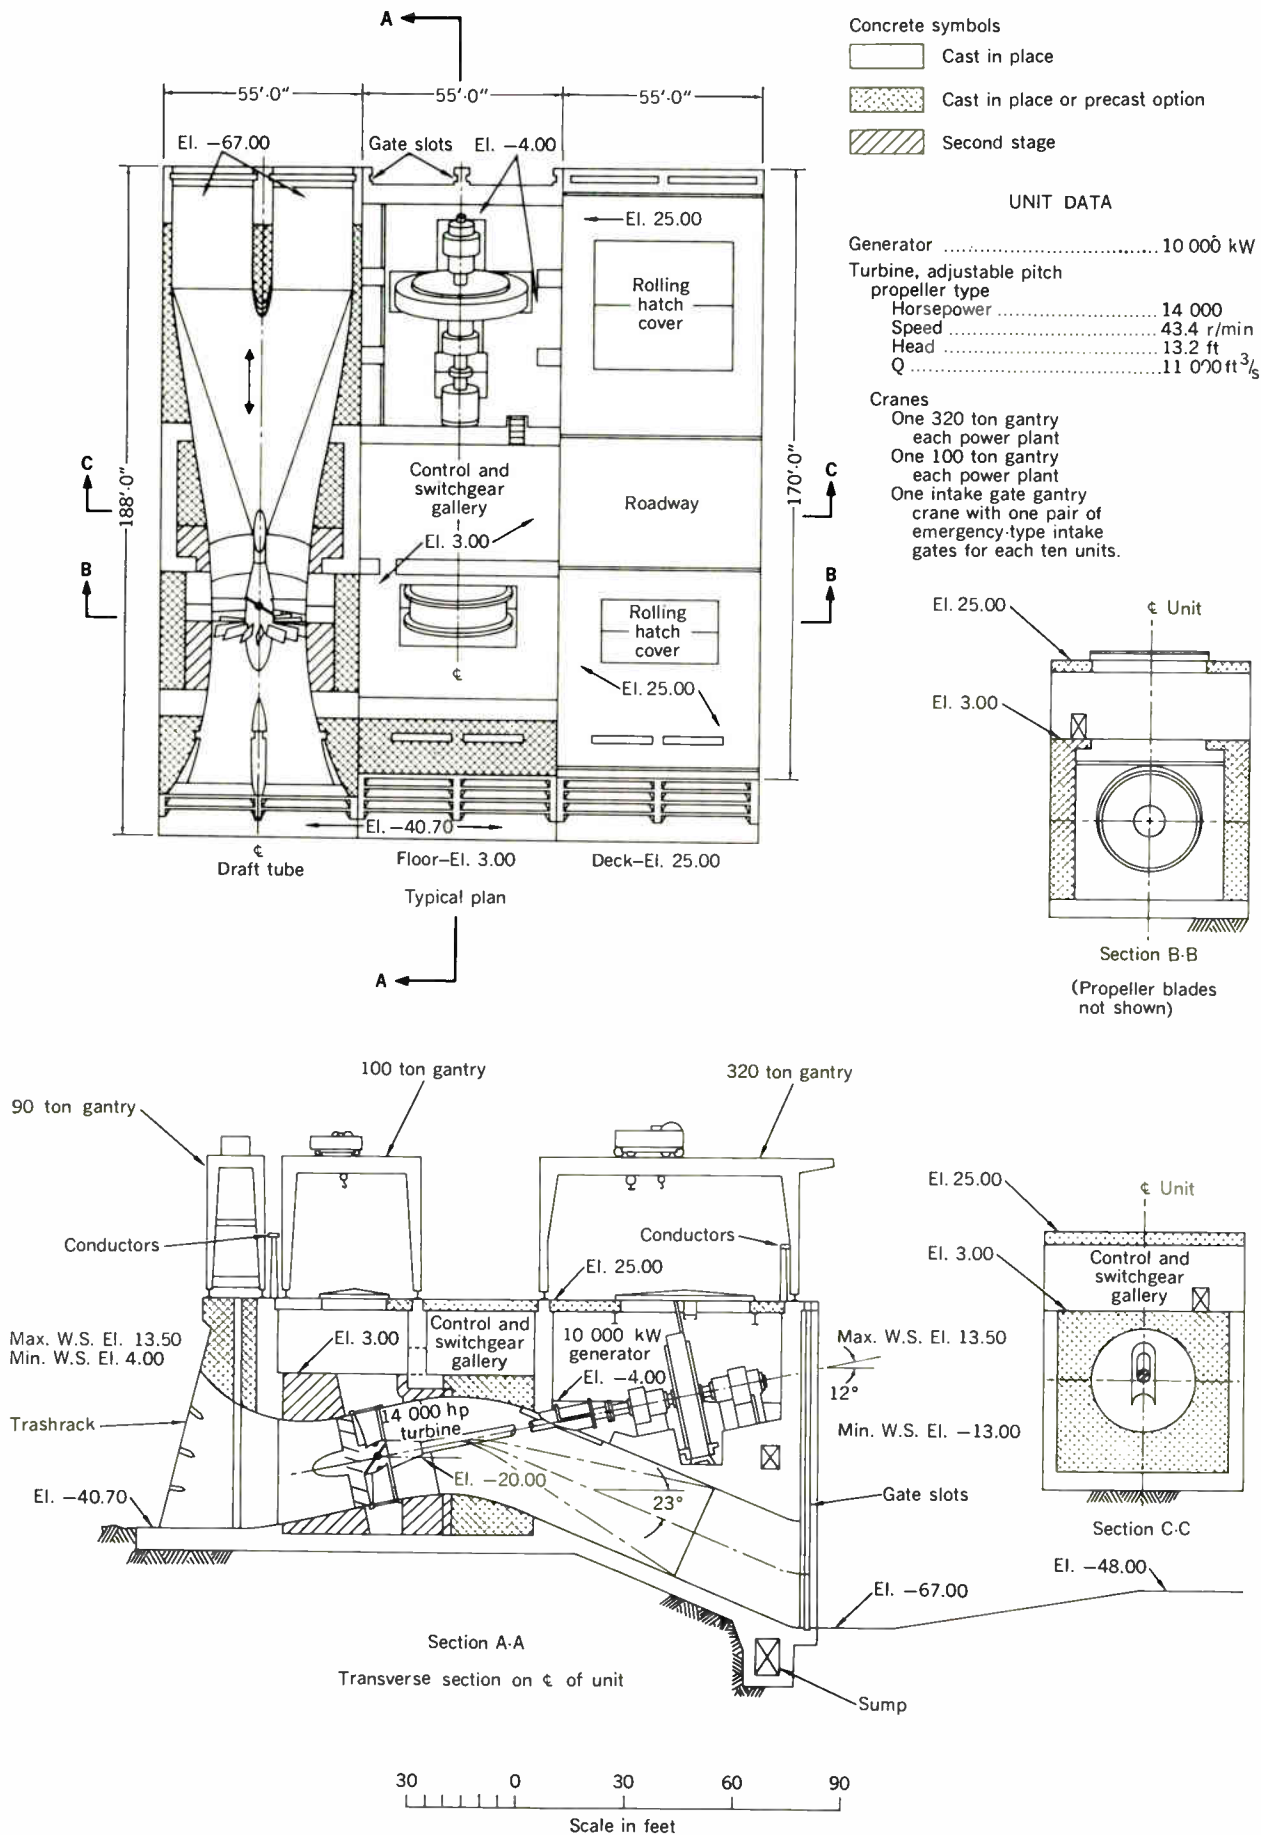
Plan and sections of typical turbogenerator unit of the 50 proposed for each power plant.
